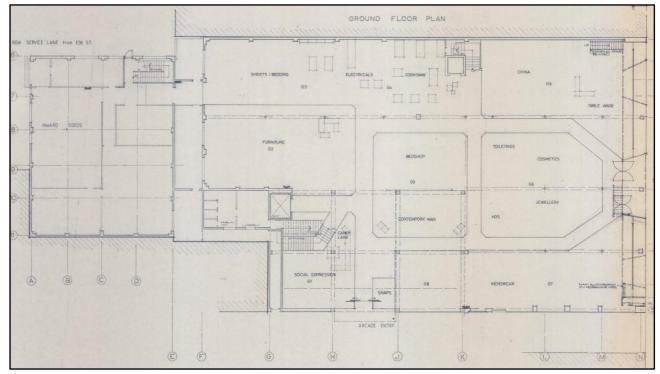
Detail from 1986 plans showing the alterations to the ground floor plan of the DIC's building (Pepper and Dixon, 1986).
